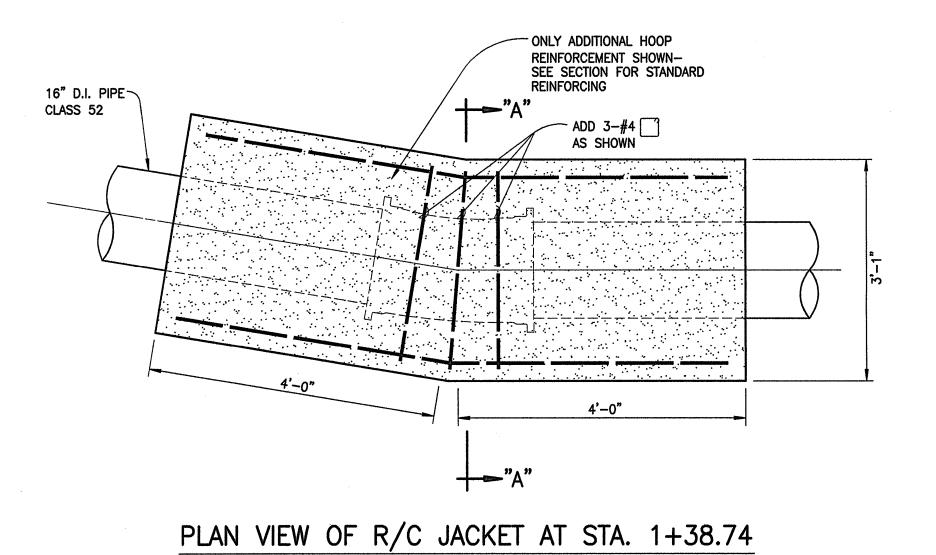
DETAIL FOR HYBRID R/C JACKET SEGMENT SCALE: 1" = 1'-0"
